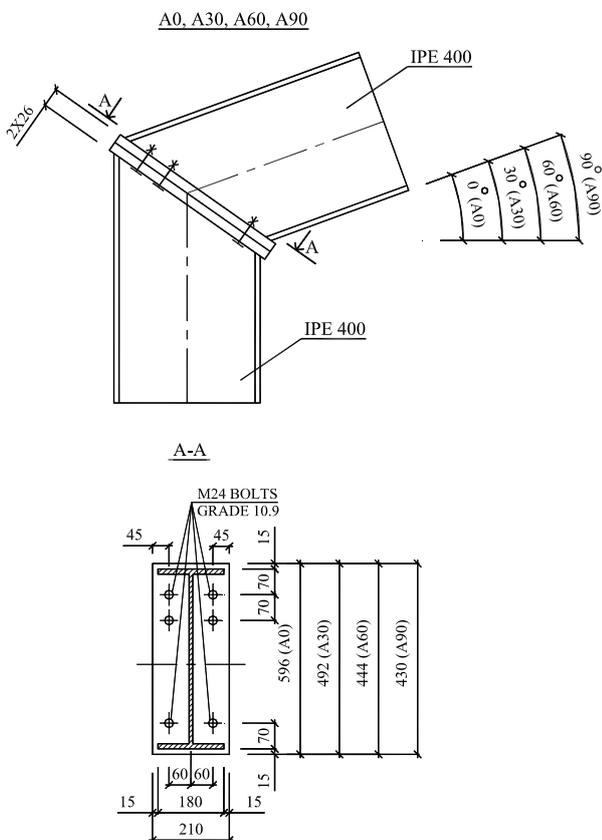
Beam-to-beam knee joints (in mm): general view; section A-A
